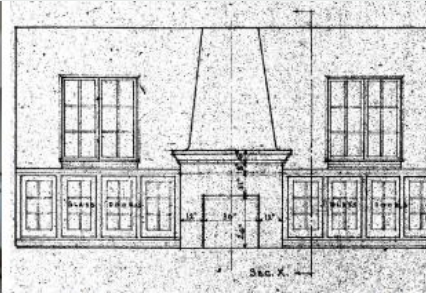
Drawing of fireplace mantel and built-ins in reception room (W. Horace Austin, Sheet 7)
